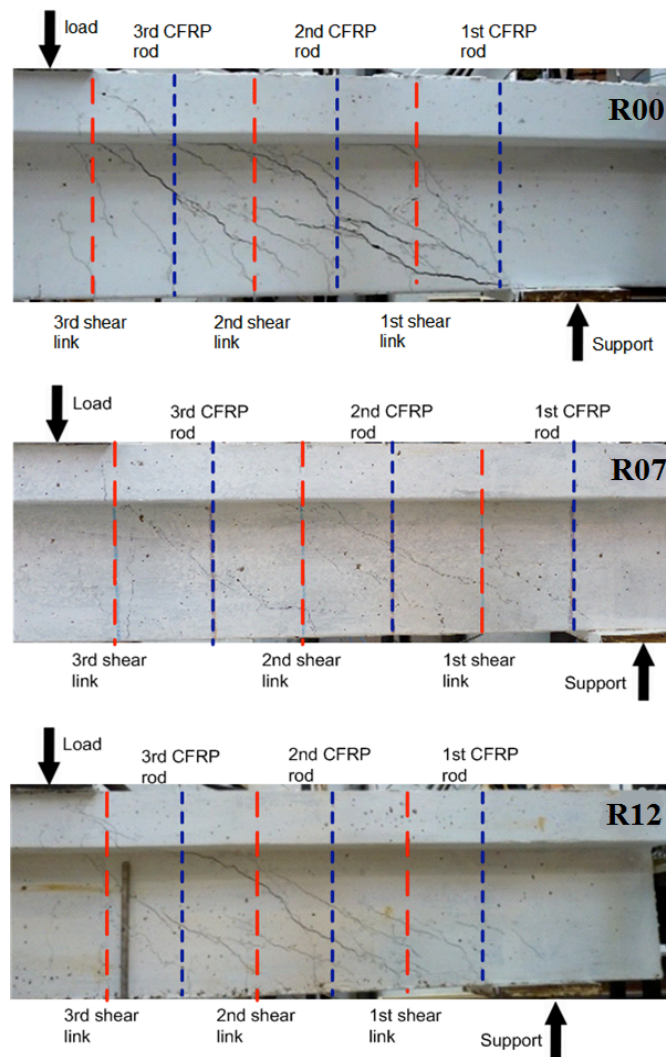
Beams strengthened with the embedded CFRP rods at failure
